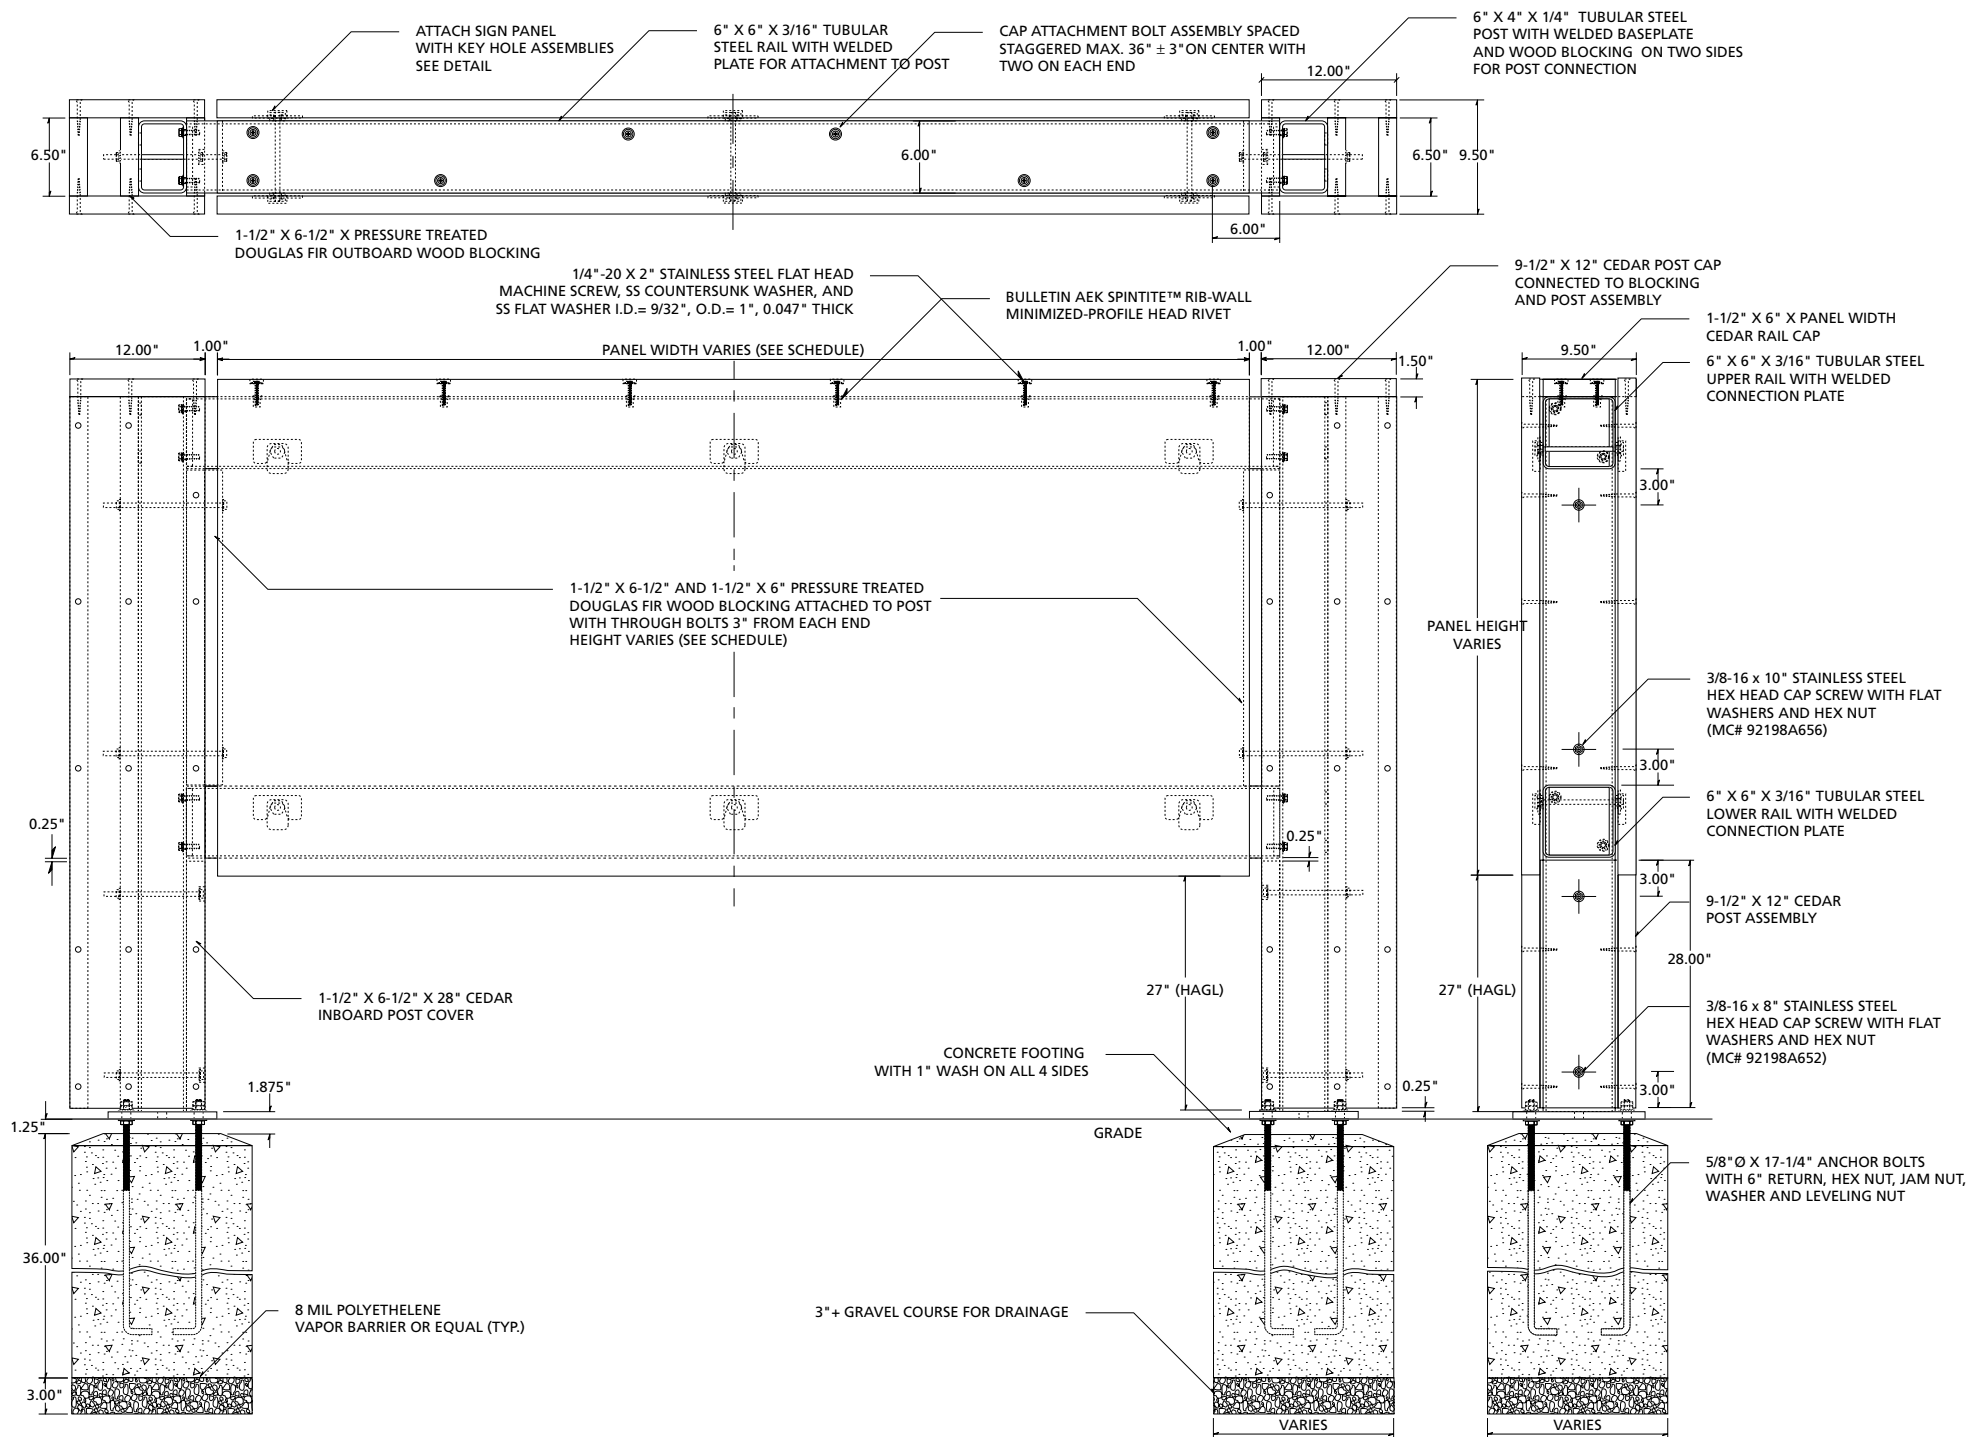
DETAIL E LOWER WOOD RAIL ASSEMBLY FRONT ELEVATION
